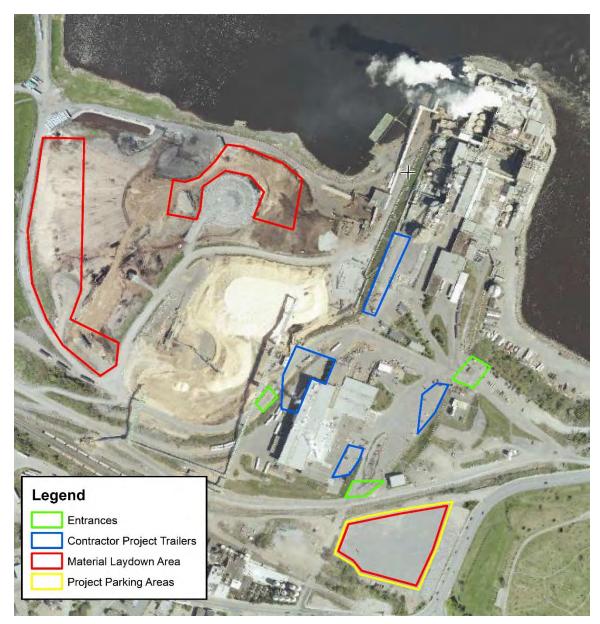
Aerial photograph of the Reversing Falls Mill in Saint John, New Brunswick showing the locations proposed for contractor project trailers, project parking areas, material laydown areas, and construction entrances for construction of the pulp dryer modernization project.
